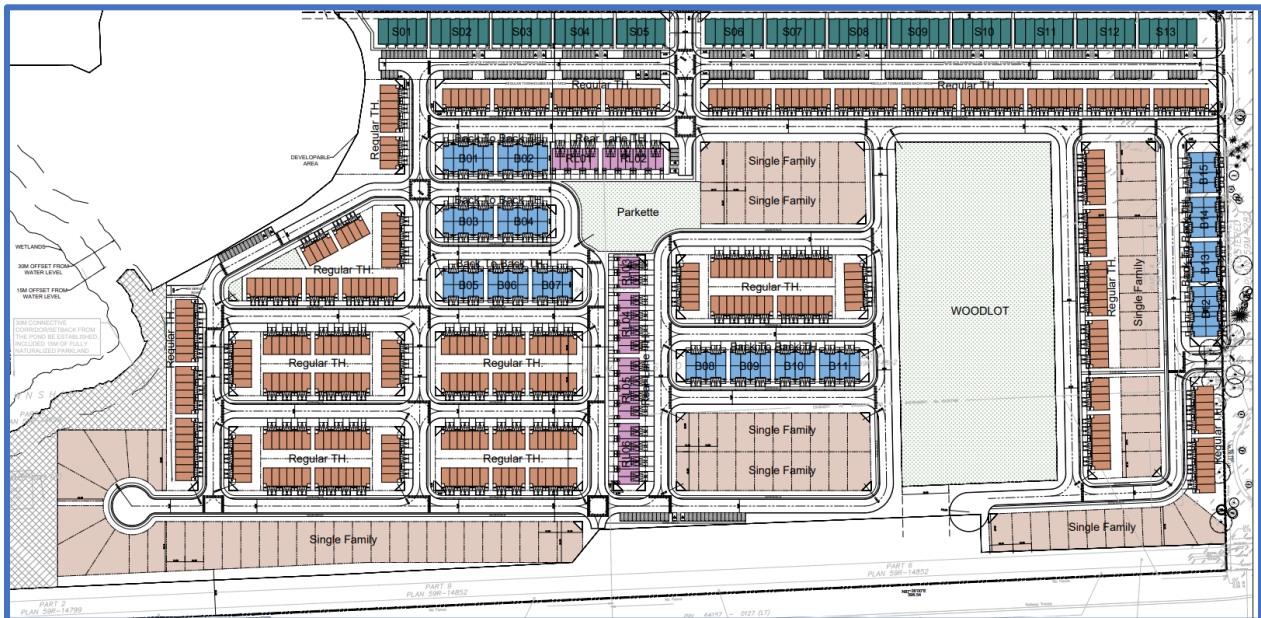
Southern portion of the Site Plan showing townhouse forms and single detached lots.
